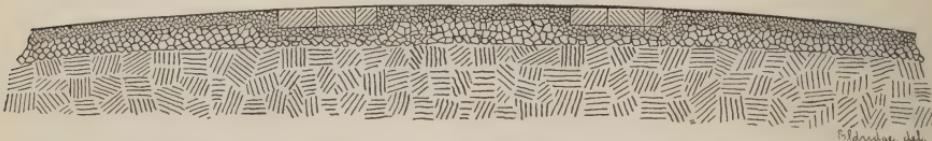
Cross-section of proposed 16-foot macadam roadway, with paving brick trackway.
